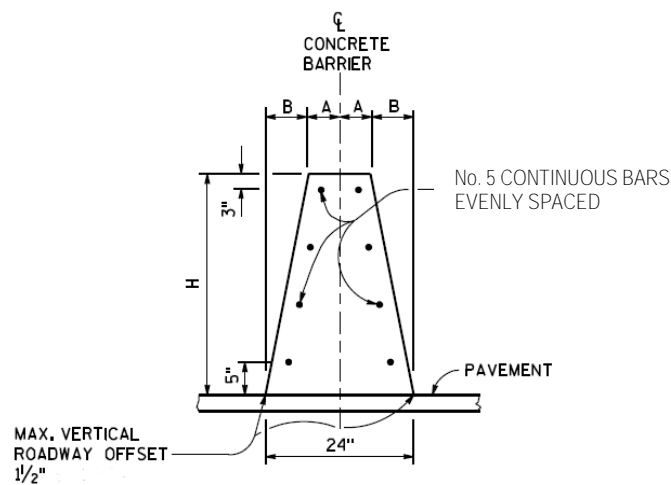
Typical section for single-slope concrete barriers type S32 and S42 [Adapted from Ref. [9] (see Table 3-1 for the dimensions A, B, and H, number of bars, and side cover)
